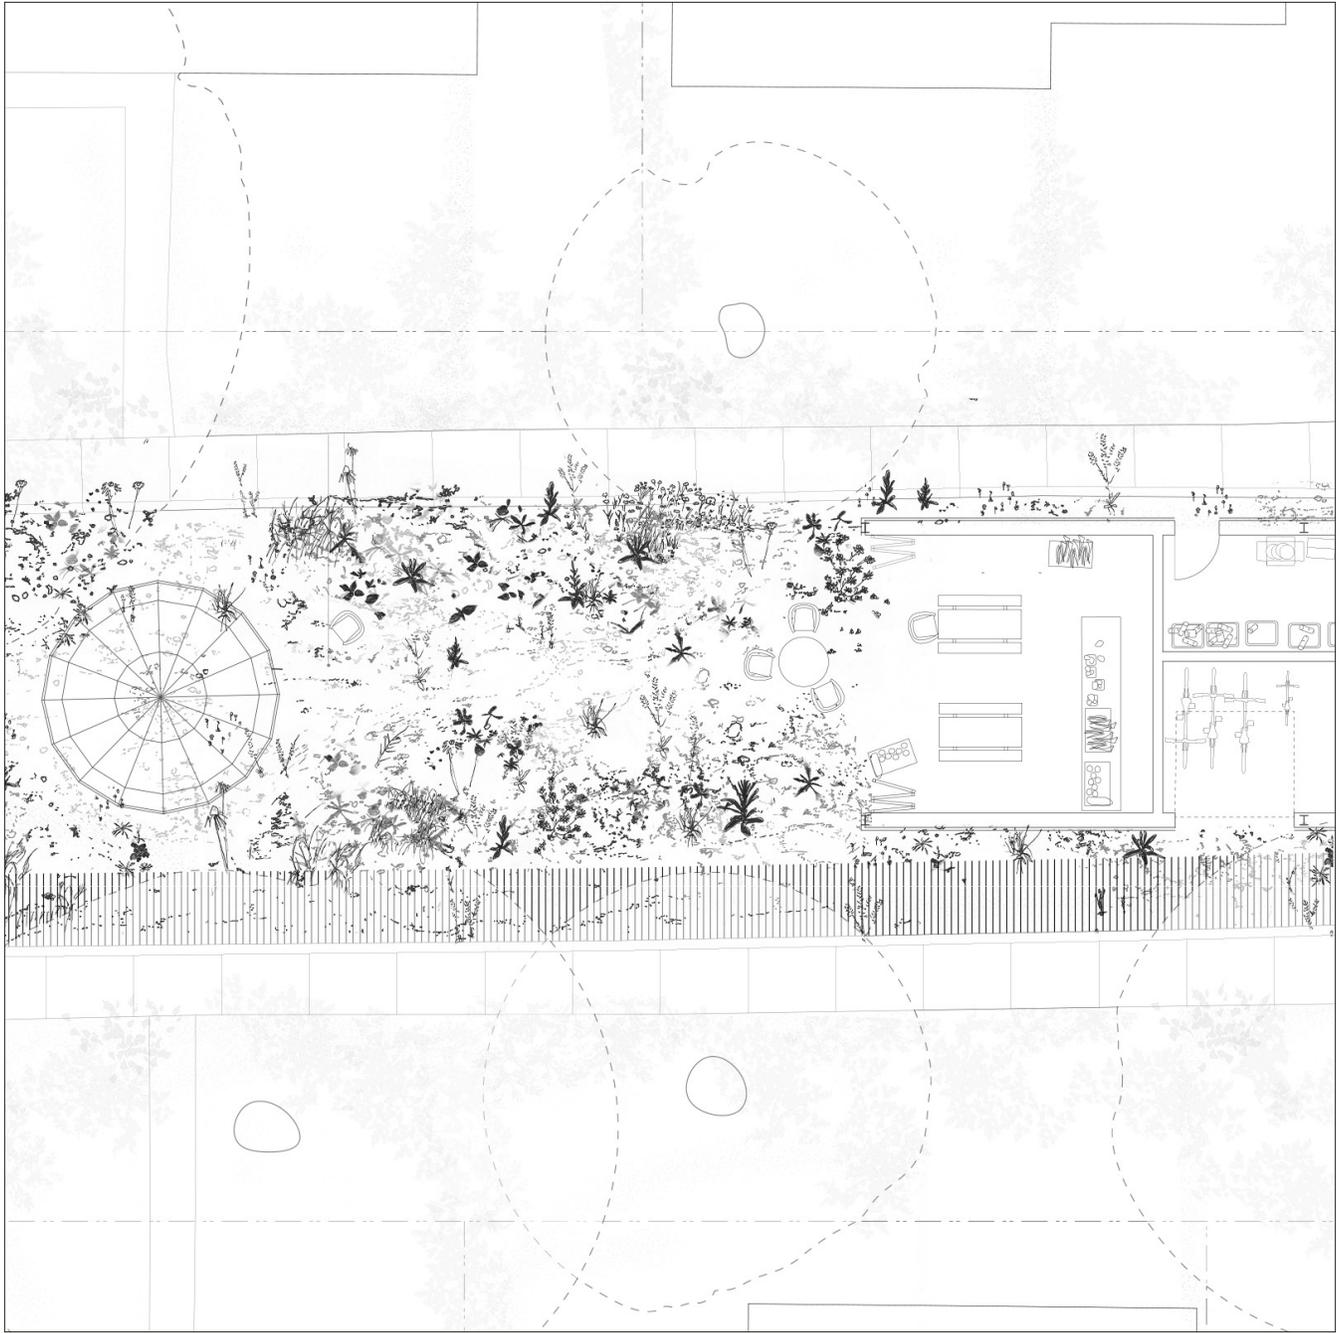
Glencairn Avenue, ruderal aftermath as a playful landscape, plan view.
